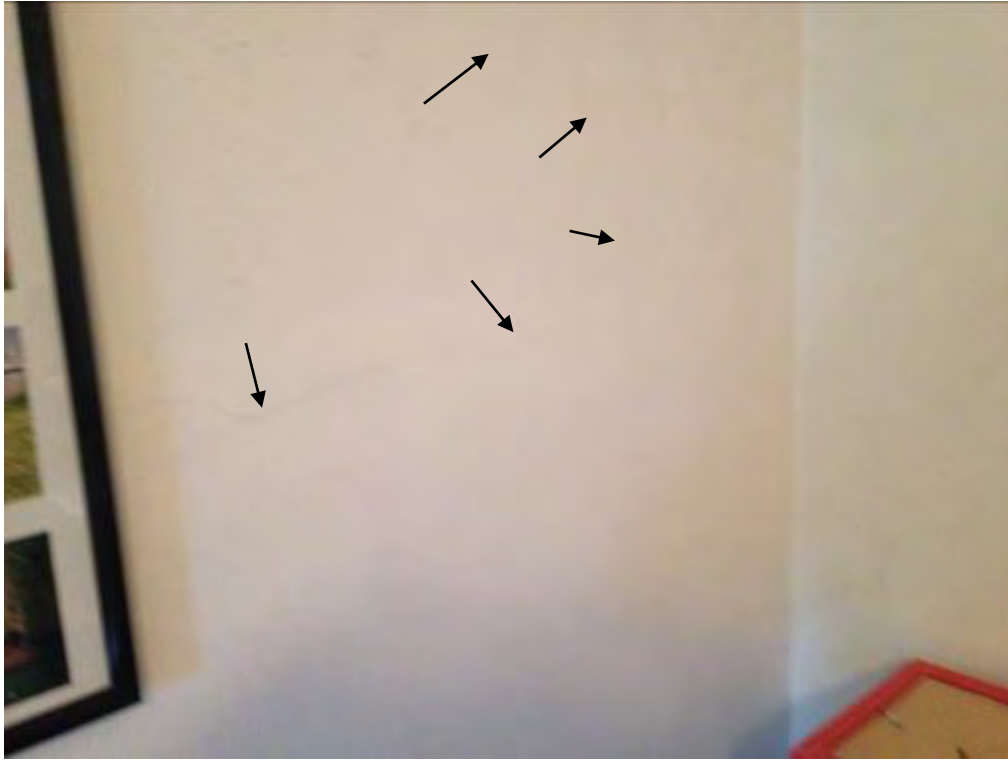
shows the radial crack extending from the front entry door head towards the highlight
